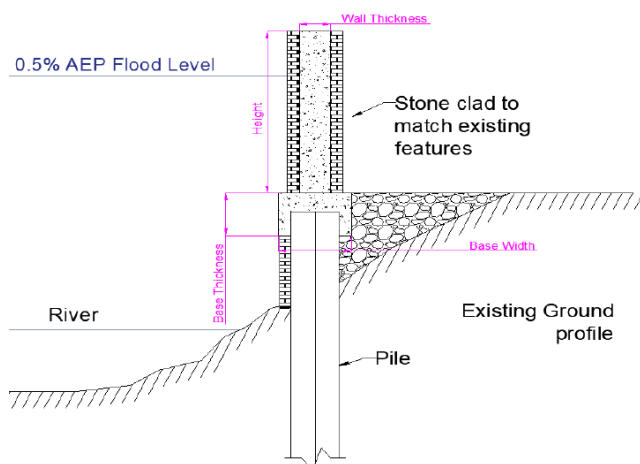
Sketch Sheet Pile (SSP) Flood Wall with Facing
